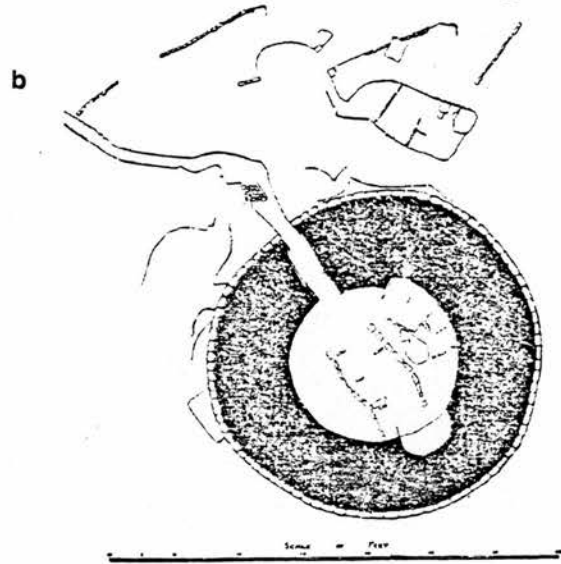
"Broch at the White Gate," Keiss (No. 516); Ground-plan.
